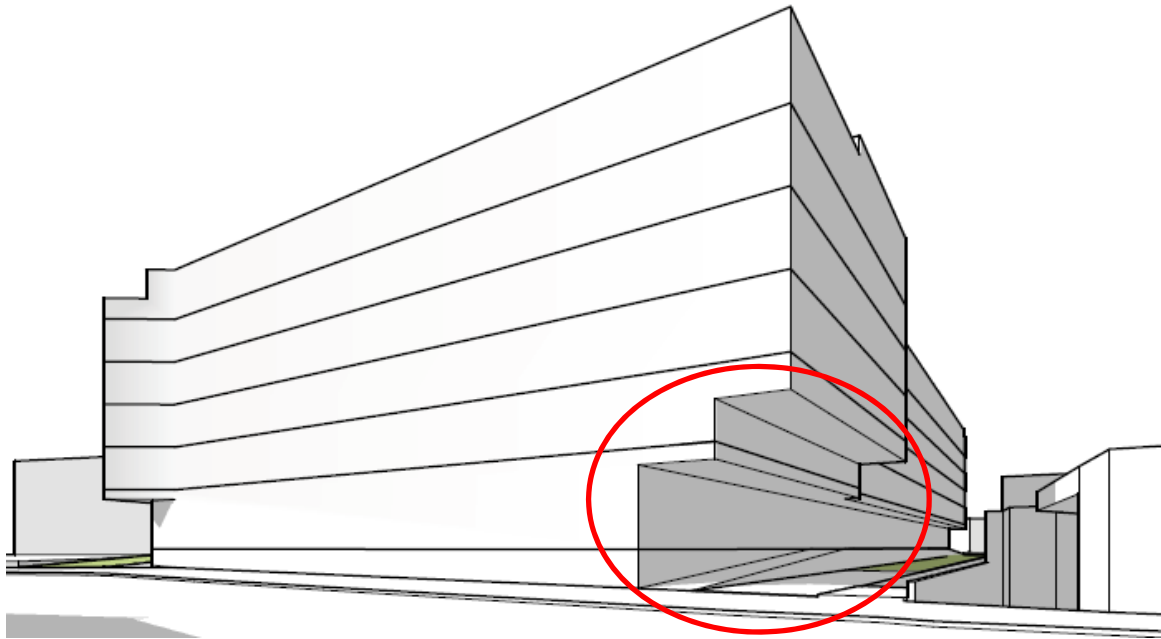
A 3D massing of the view from Ralph Street of the cantilevered building.
